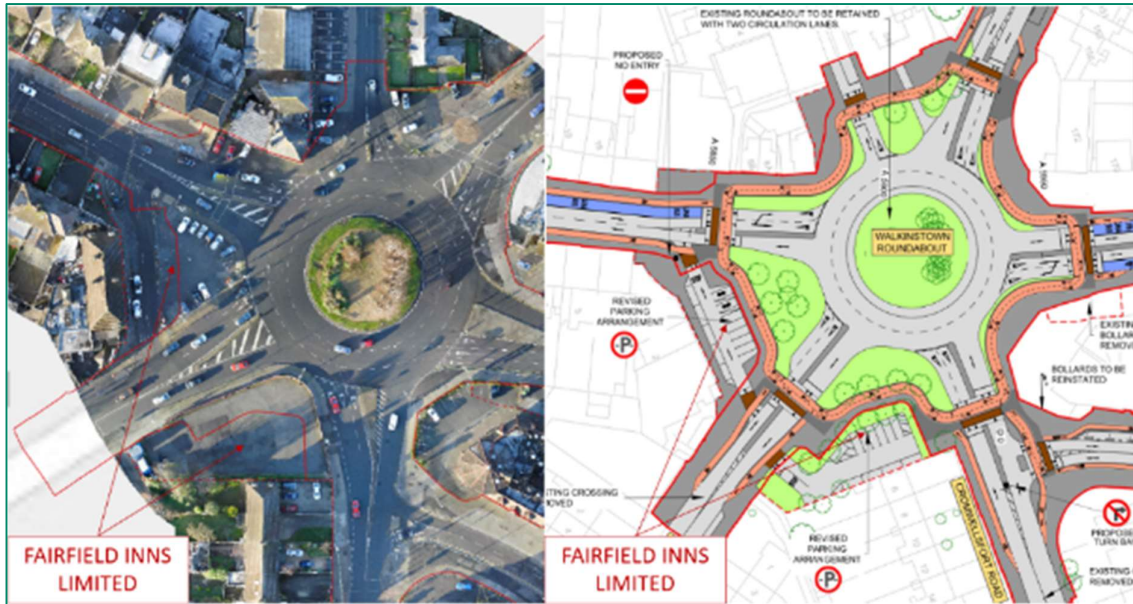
Existing and Proposed Layout at Fairfield Inns Limited property
